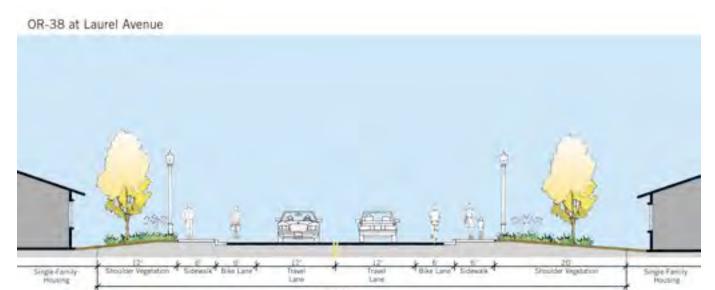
Central Umpqua Avenue (OR 38) Typical Section
